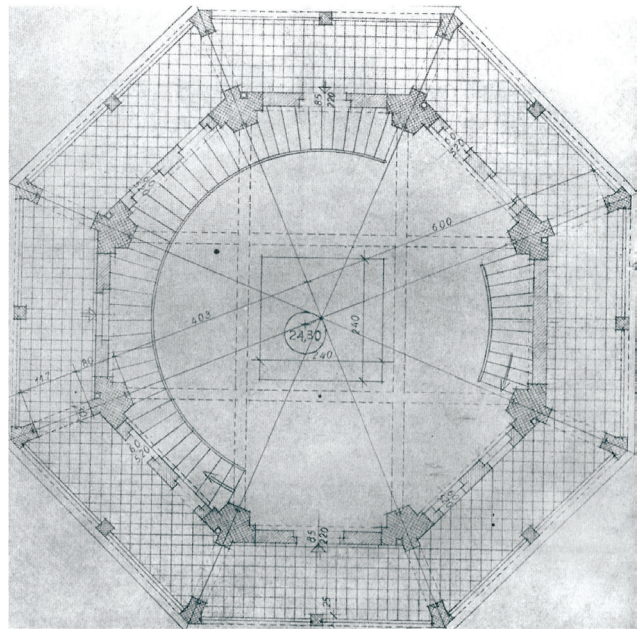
P. Zanini, Plan of the bell tower at elevation m 24.30. Zanini Archive, Civici Musei, Udine.
